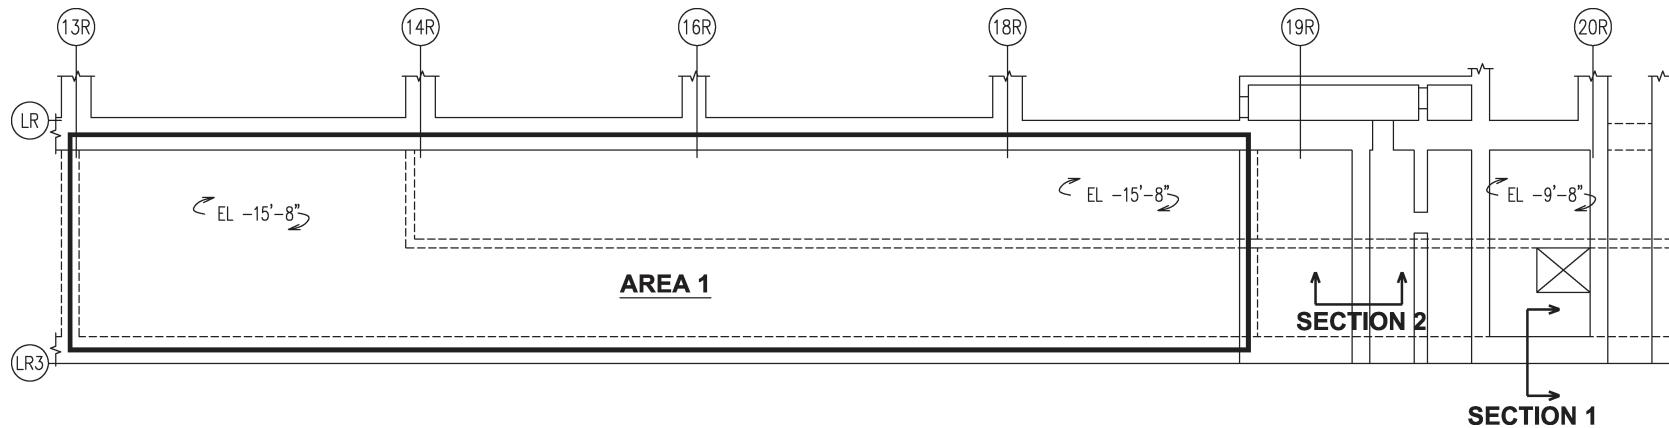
[ESWPC Representative Elements \(Floor Plan of East ESWPC, EL -15'-8"\)](#)
